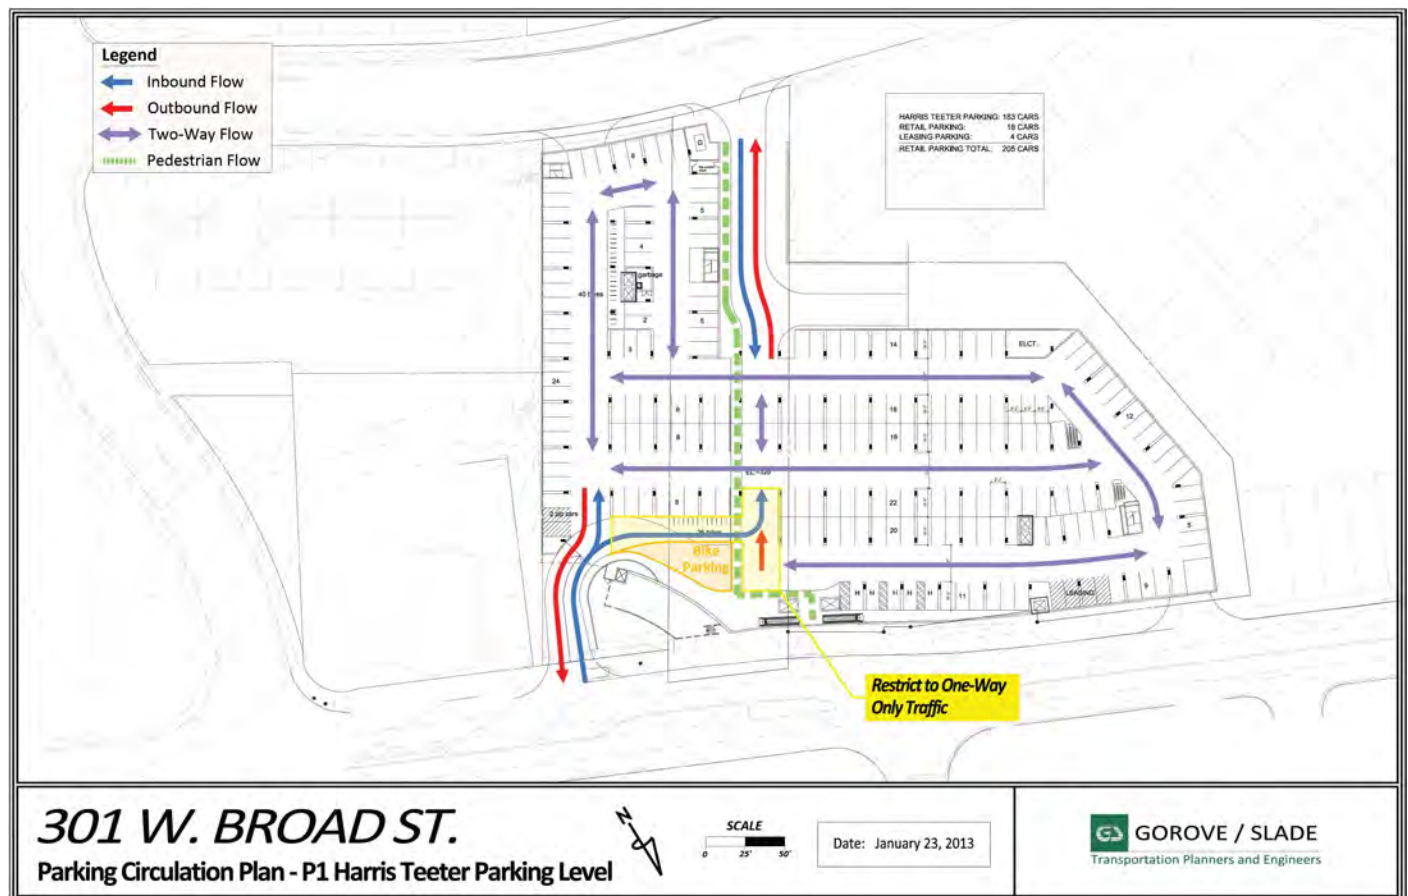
Parking Circulation Plan – P1 Harris Teeter Parking Level
